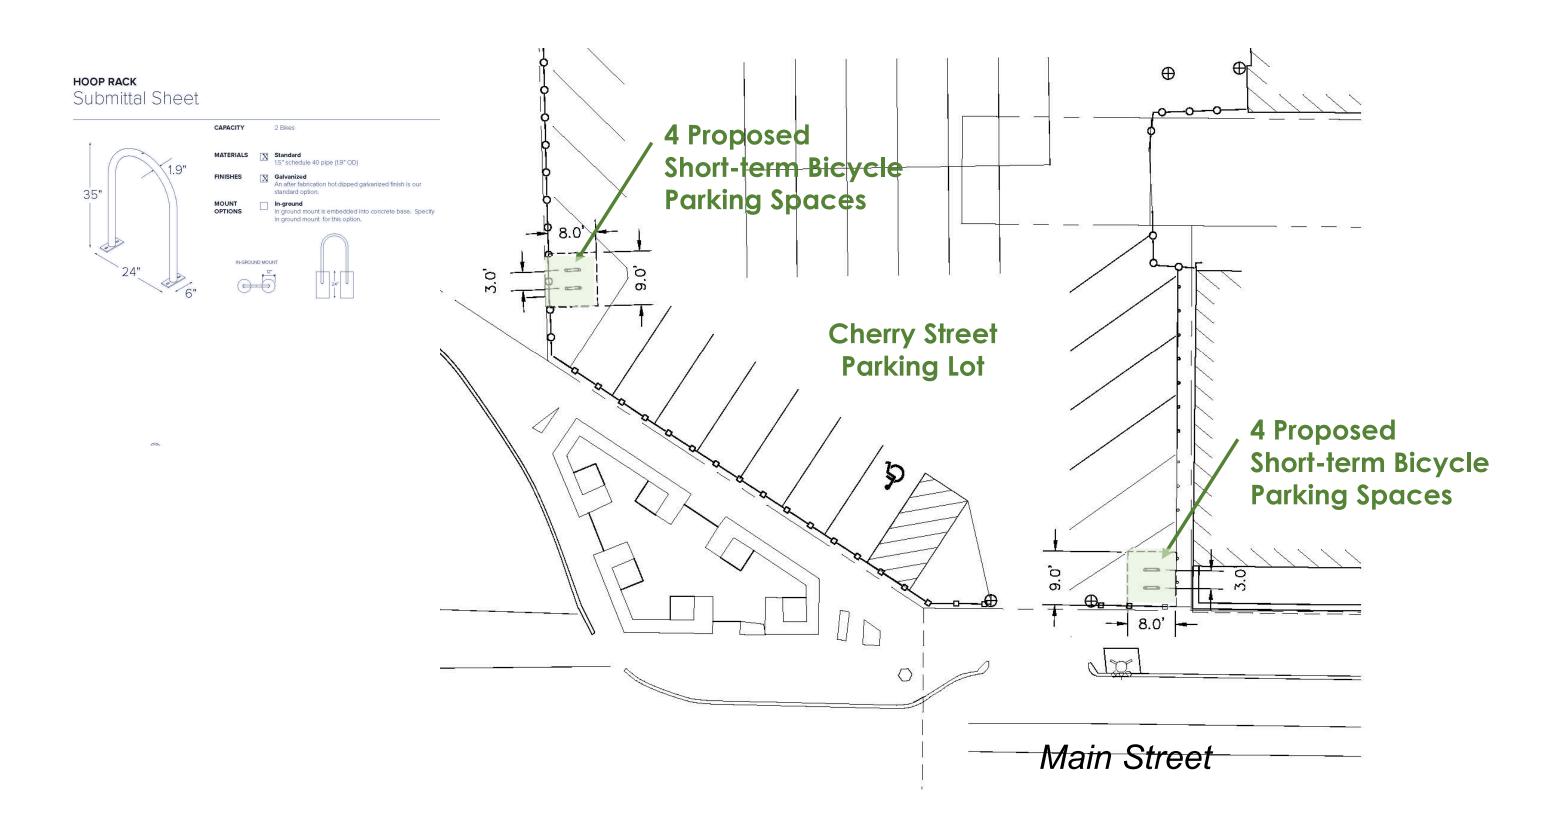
PROPOSED SITE PLAN: BICYCLE PARKING
